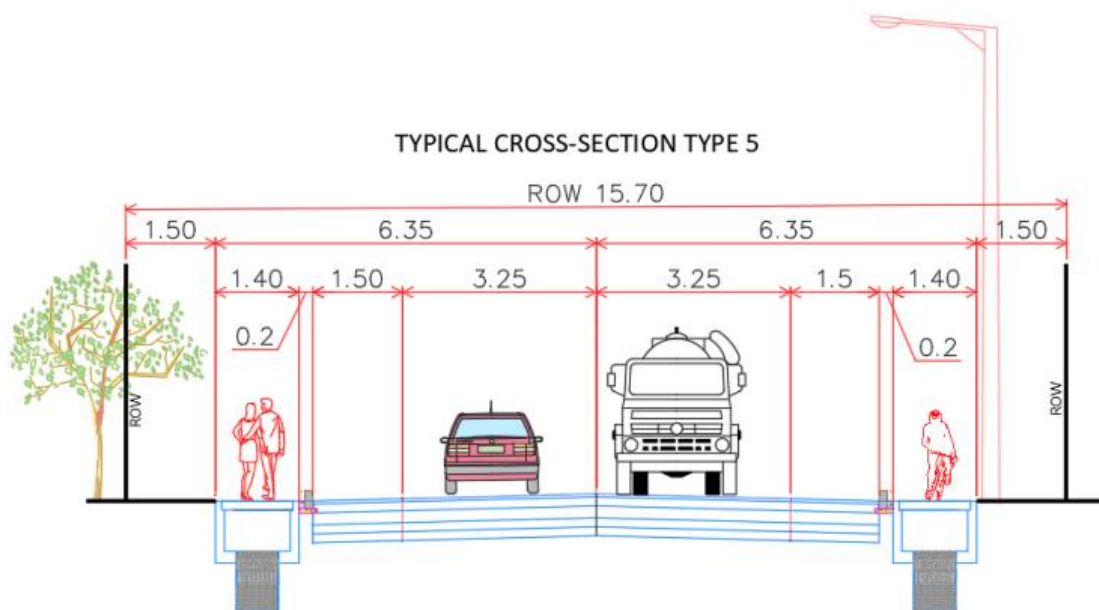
Typical cross sections Type 5 for Collector roads (Urban Area)
